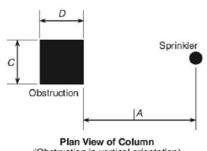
Suspended or Floor-Mounted Obstruction in Light Hazard Occupancies Only (SSU/SSP).
